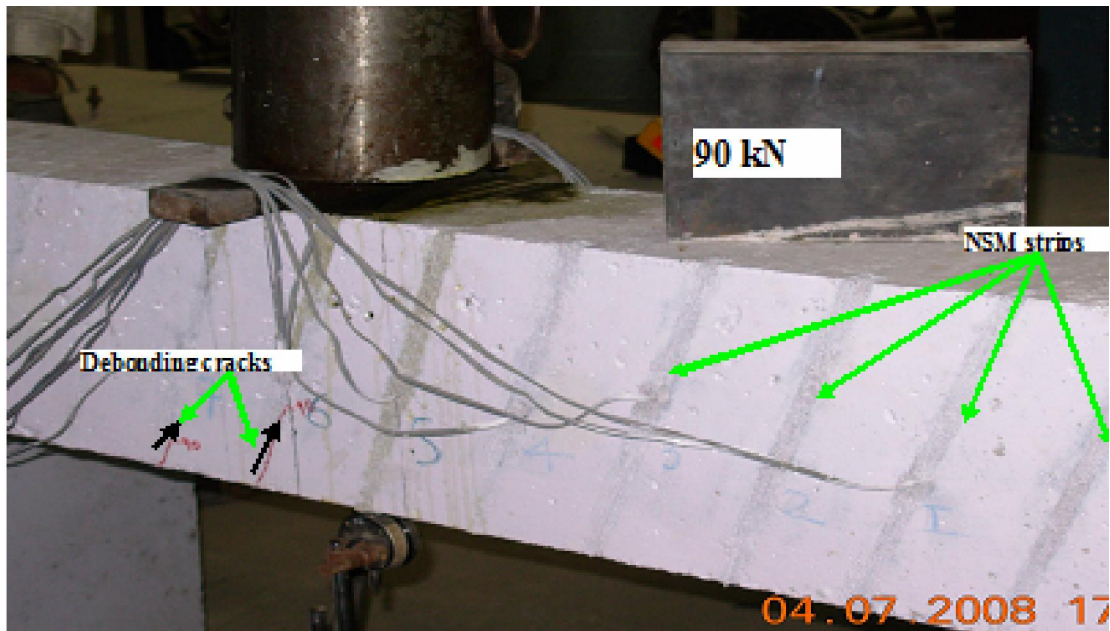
Test B1-SS crack pattern at 90 kN (Face SW)
